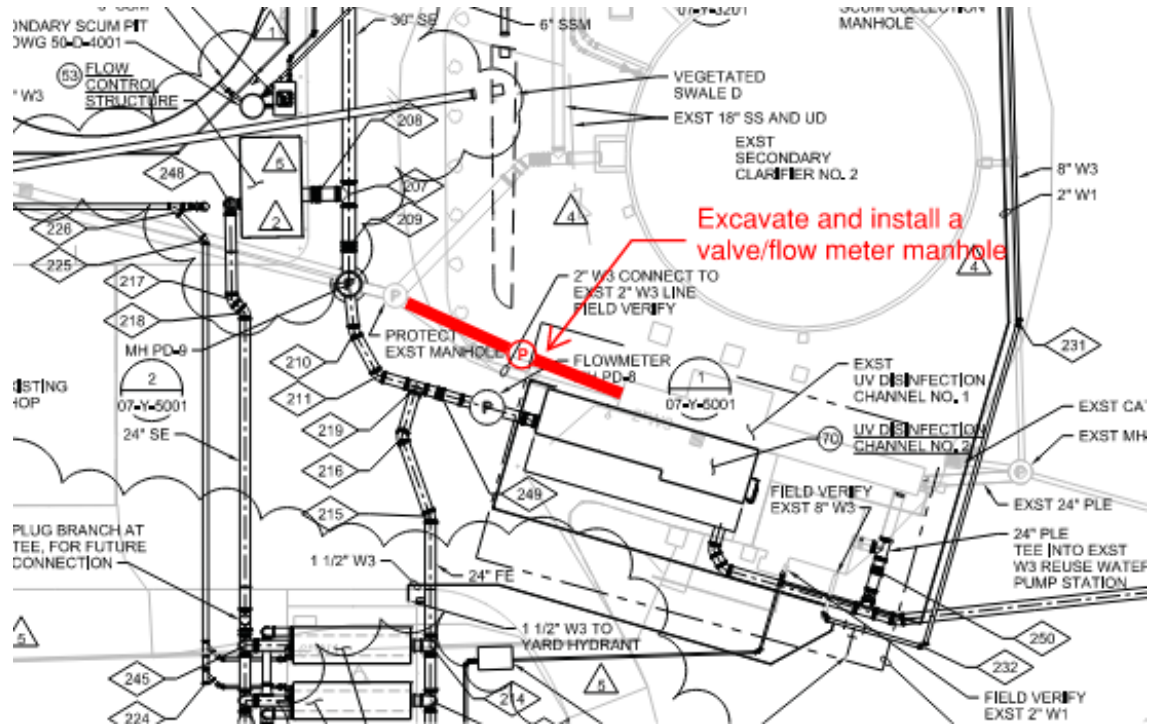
Location of proposed upstream valve/flow meter manhole vault
